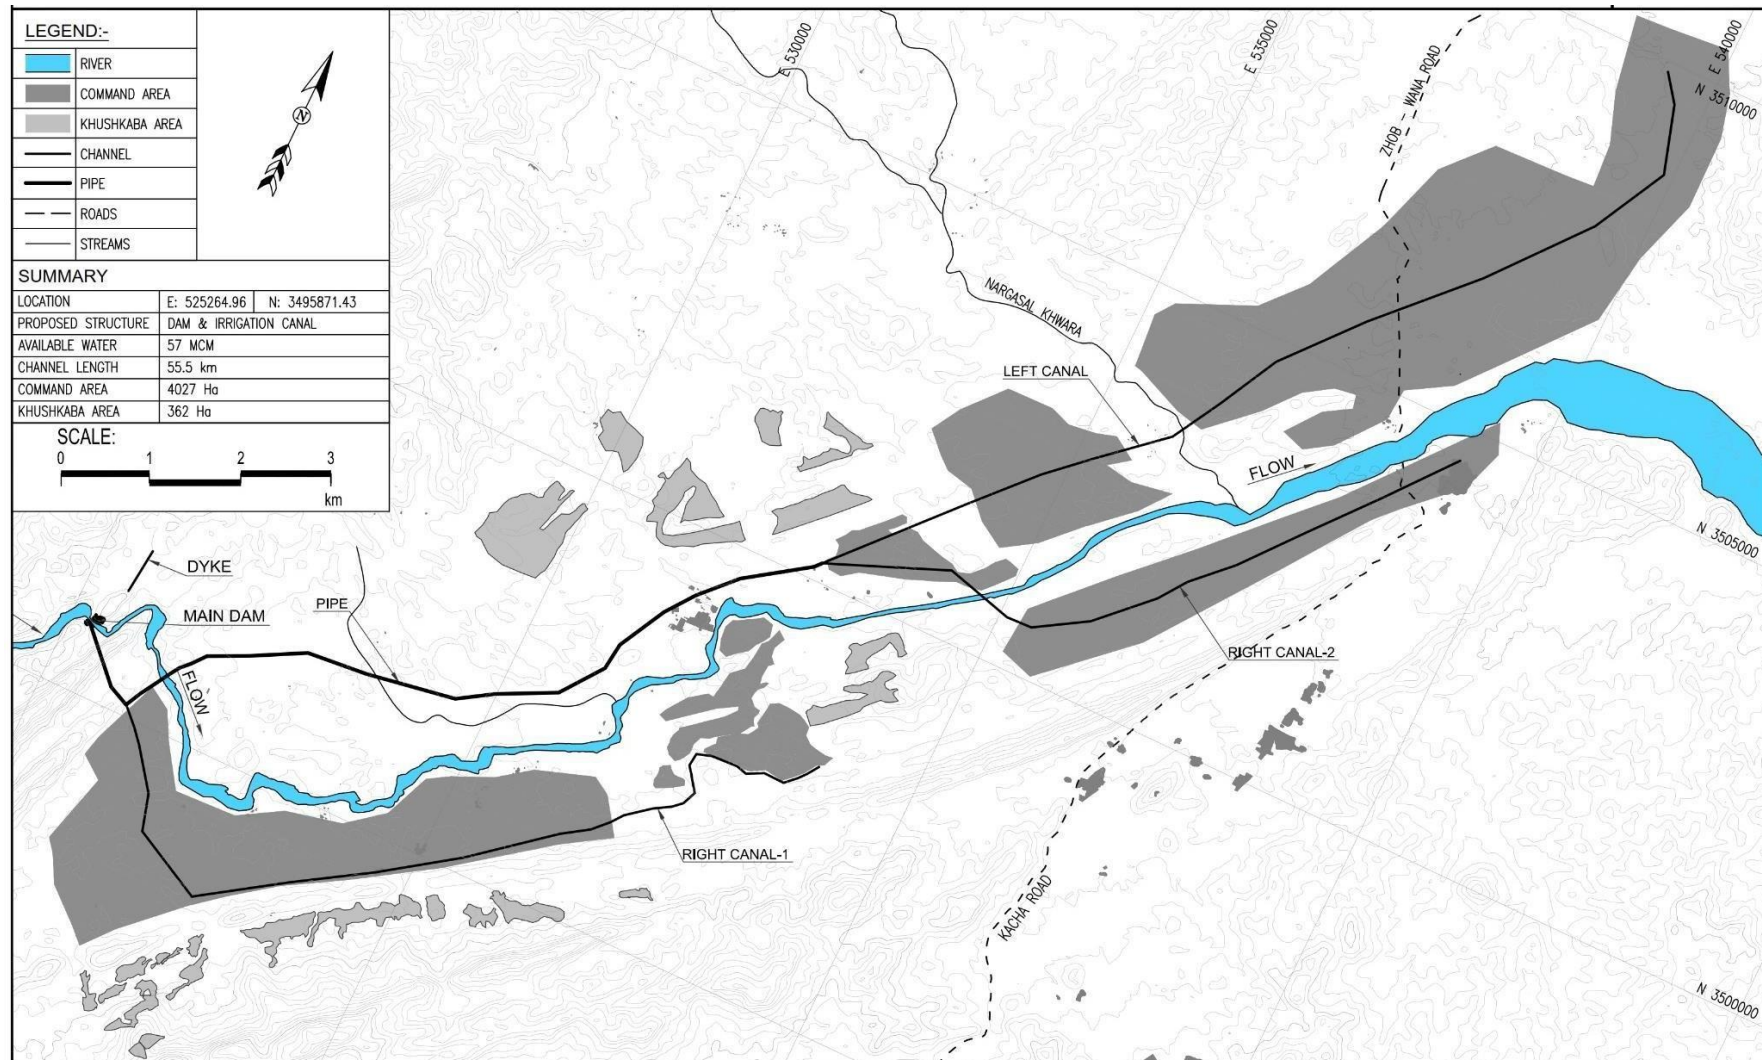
Siri Toi water storage dam sub-project – layout plan
